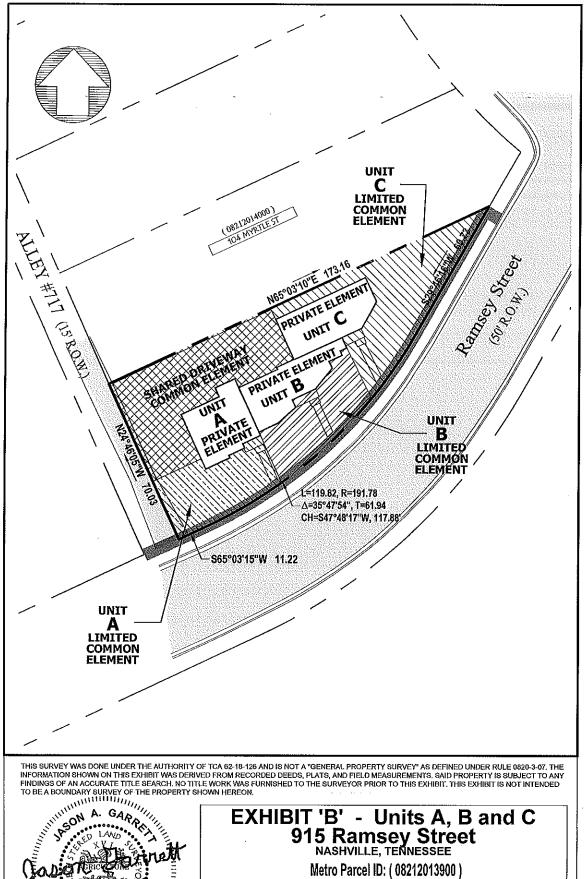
EXHIBIT 'B' - Units A, B and C 915 Ramsey Street NASHVILLE, TENNESSEE
